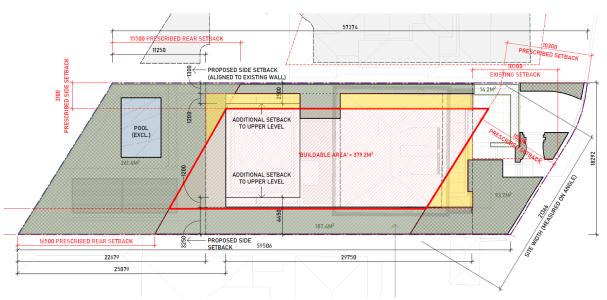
The image above details the building envelope applicable to the site, with non-compliances with the building setbacks highlighted in yellow
